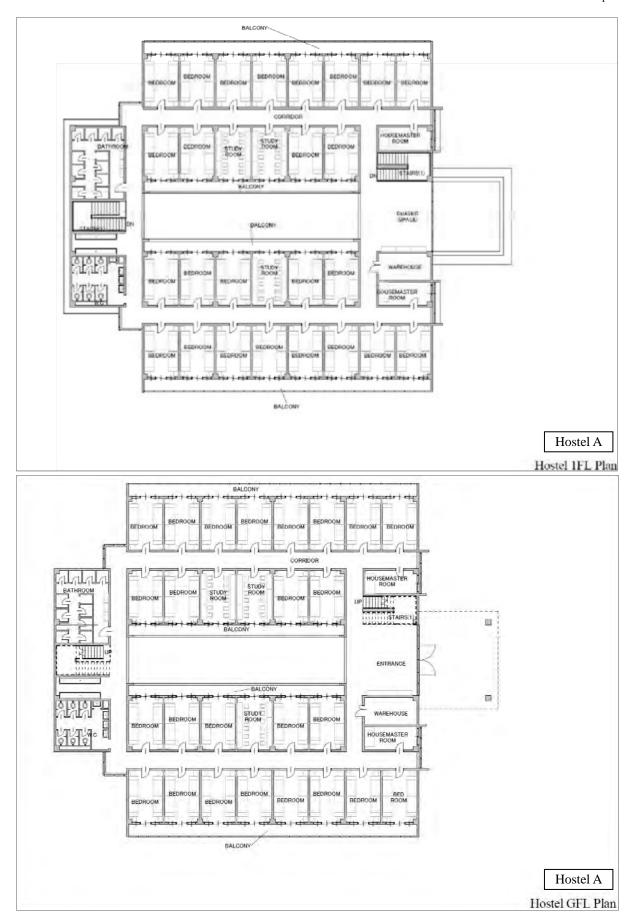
Plan of Hostel A (Ground Floor & 1st Floor)
